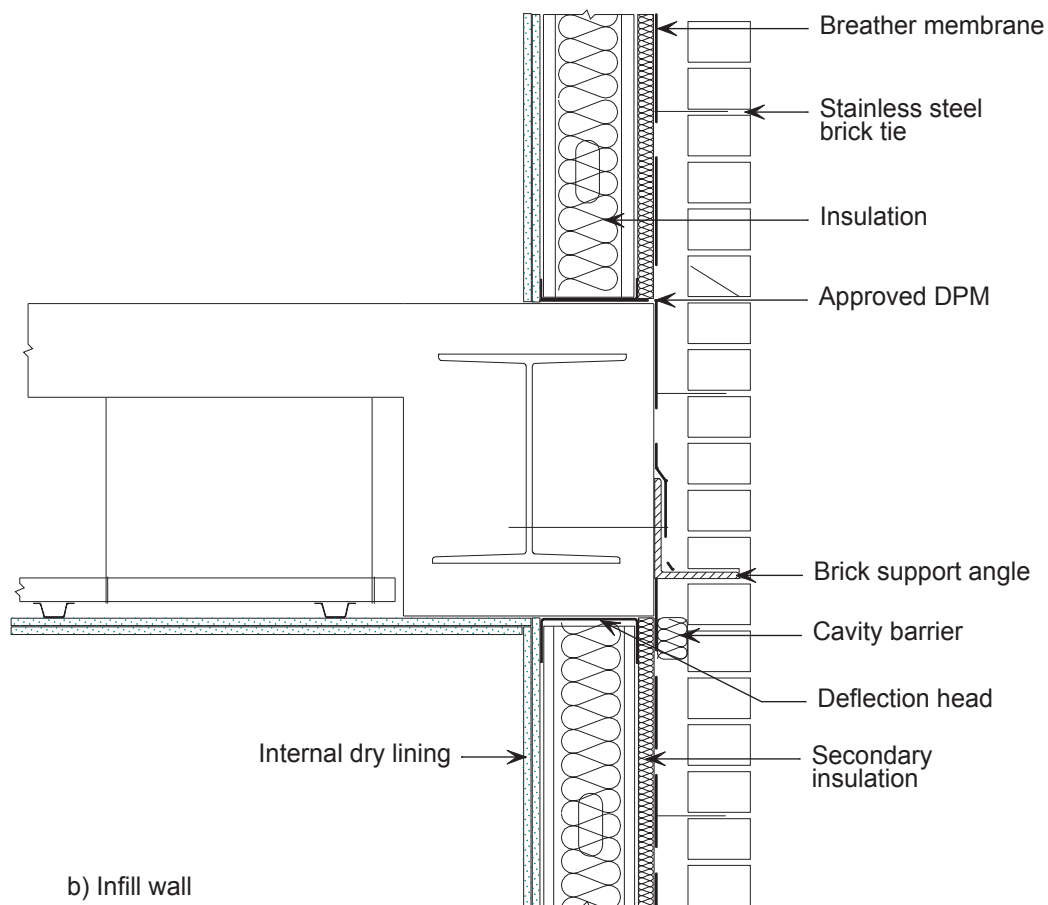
Infill wall in a hot rolled steel or concrete framed building
